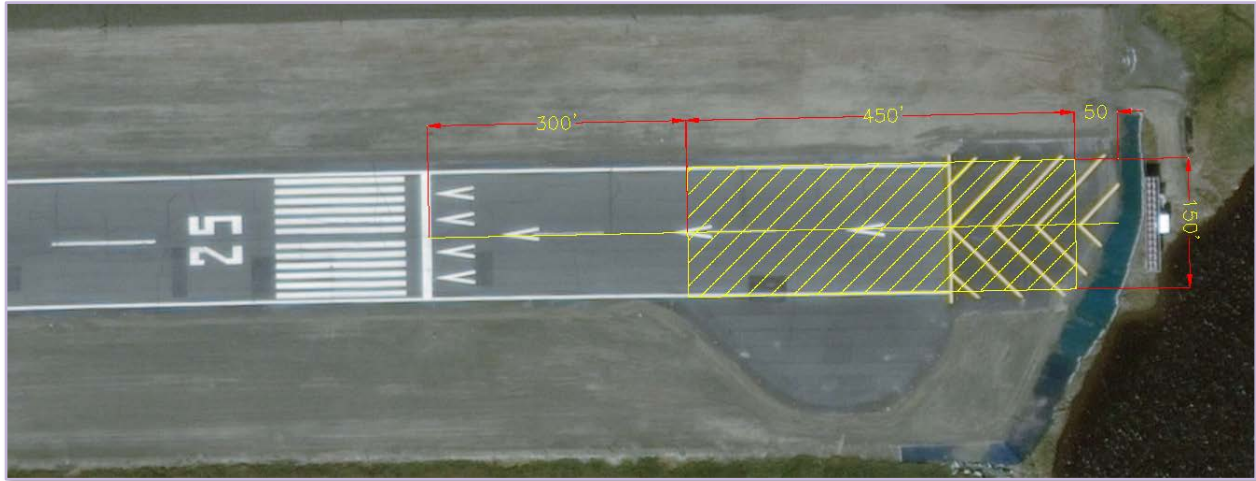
Potential Non-Standard EMAS Installation on East End
